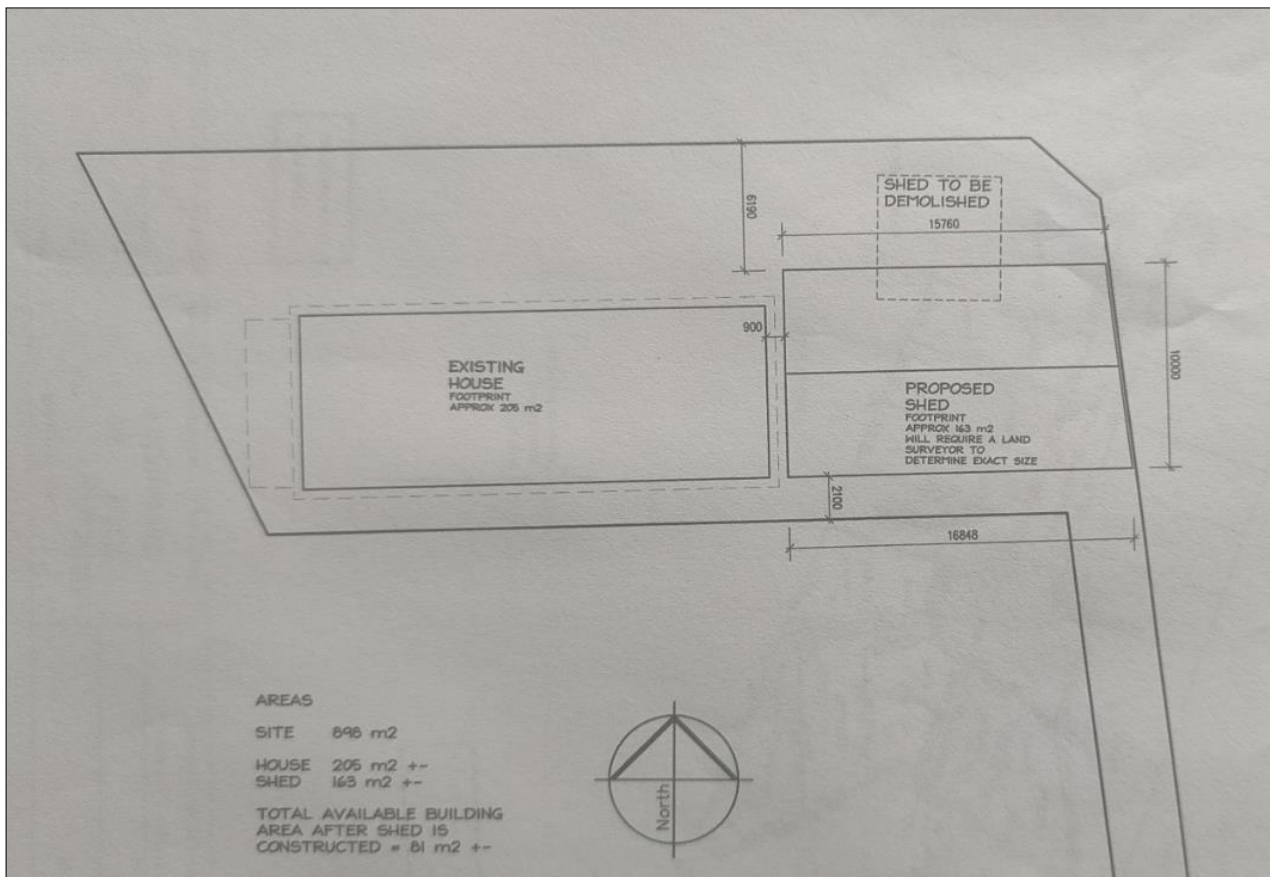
Site plan (Steven Penton Building Design, 2021)
